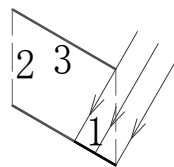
Partial enlarged drawing of horizontal louver sun-shading panel
